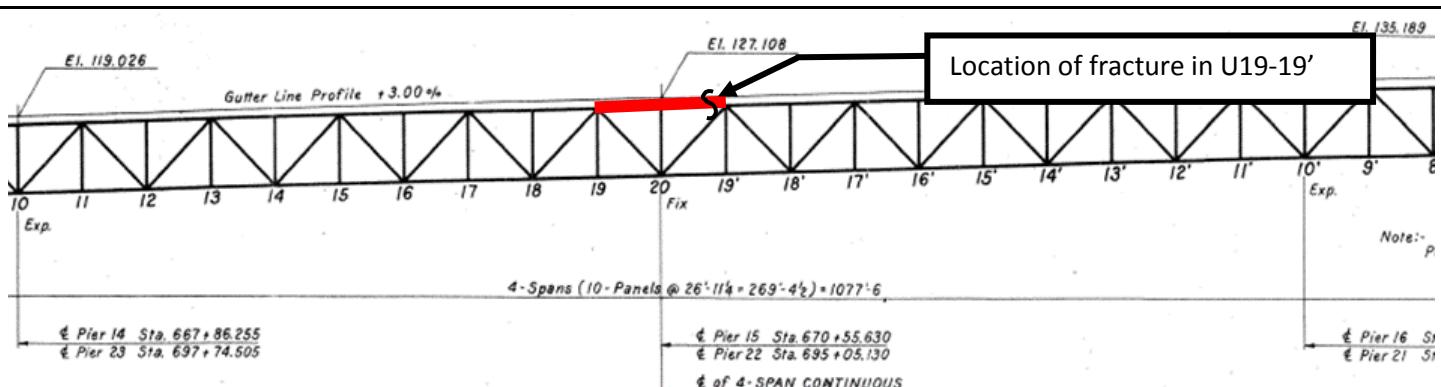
Deck Truss elevation view, Spans 15 and 16 (as-built). East to the right, north into the page.
